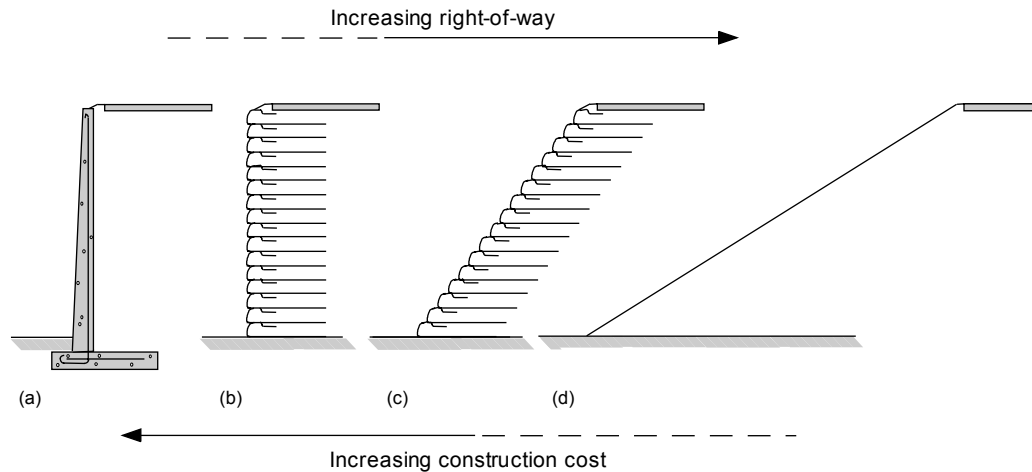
Reinforcement function of geosynthetics used to optimize the design of earth retaining structures: (a) concrete retaining wall; (b) reinforced wall; (c) reinforced slope; (d) unreinforced slope.
